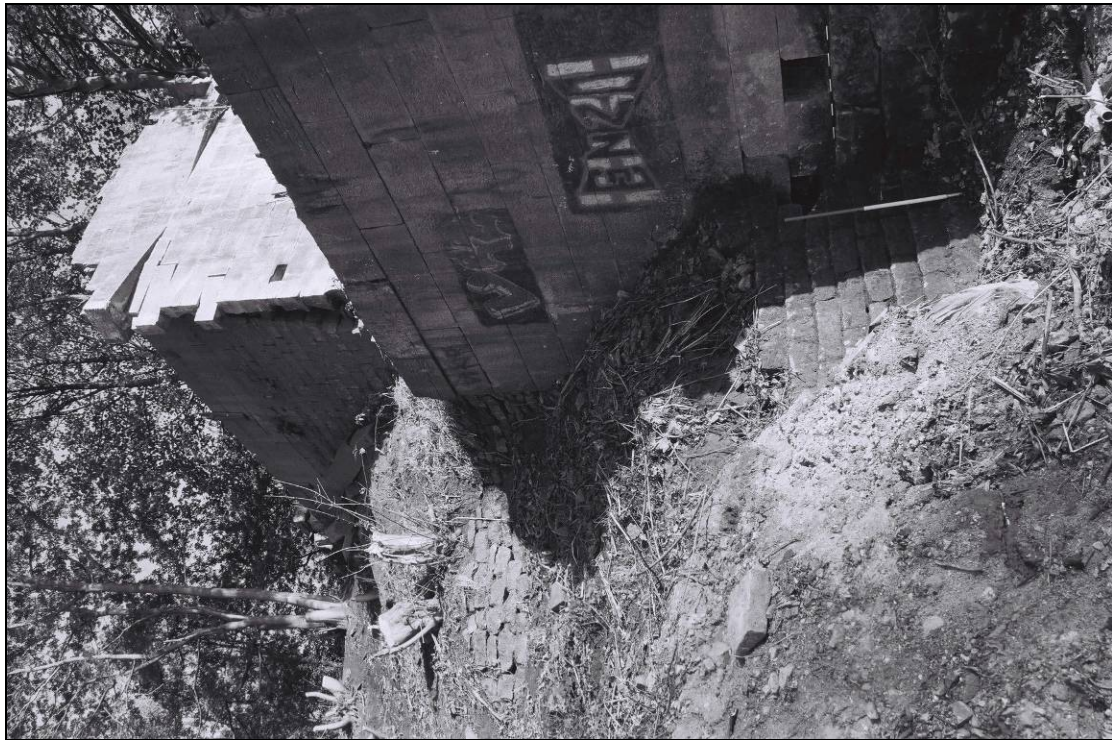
Detail of West facing elevation of building 8, note retaining wall and hole for hold down bolts (film 15:30)
